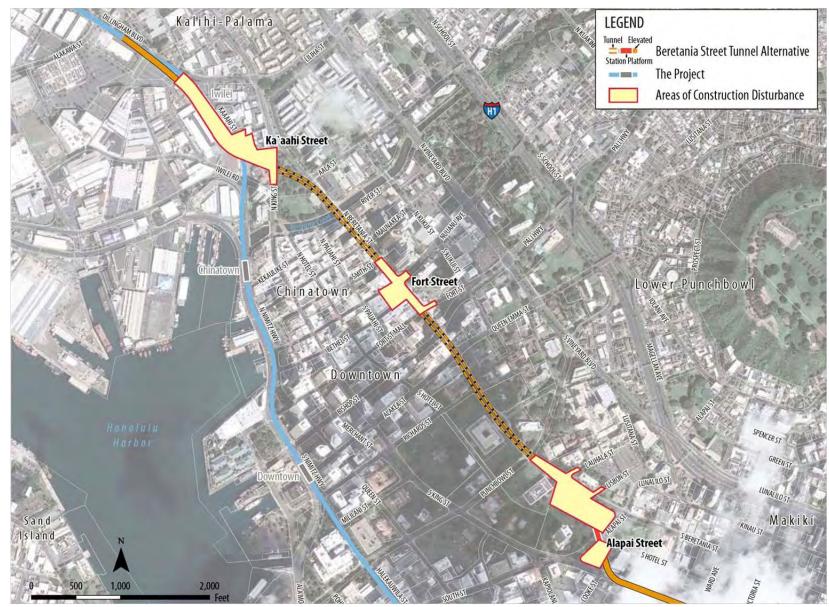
Tunnel Portal and Tunnel Station Area Disturbance during Construction
